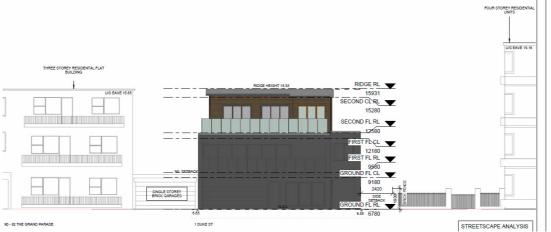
Streetscape elevation of the proposed development demonstrating the height of the proposal (coloured image) is comparable to the building located to the east of the site (left of frame) thus not resulting in any view loss to the existing residential flat building to the west of the site (right of frame).
